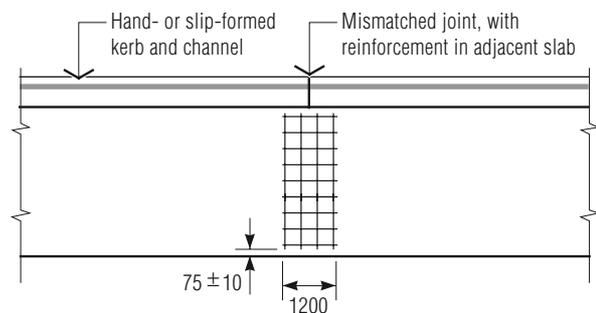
Treatment of slab opposite mismatched kerbing joint
